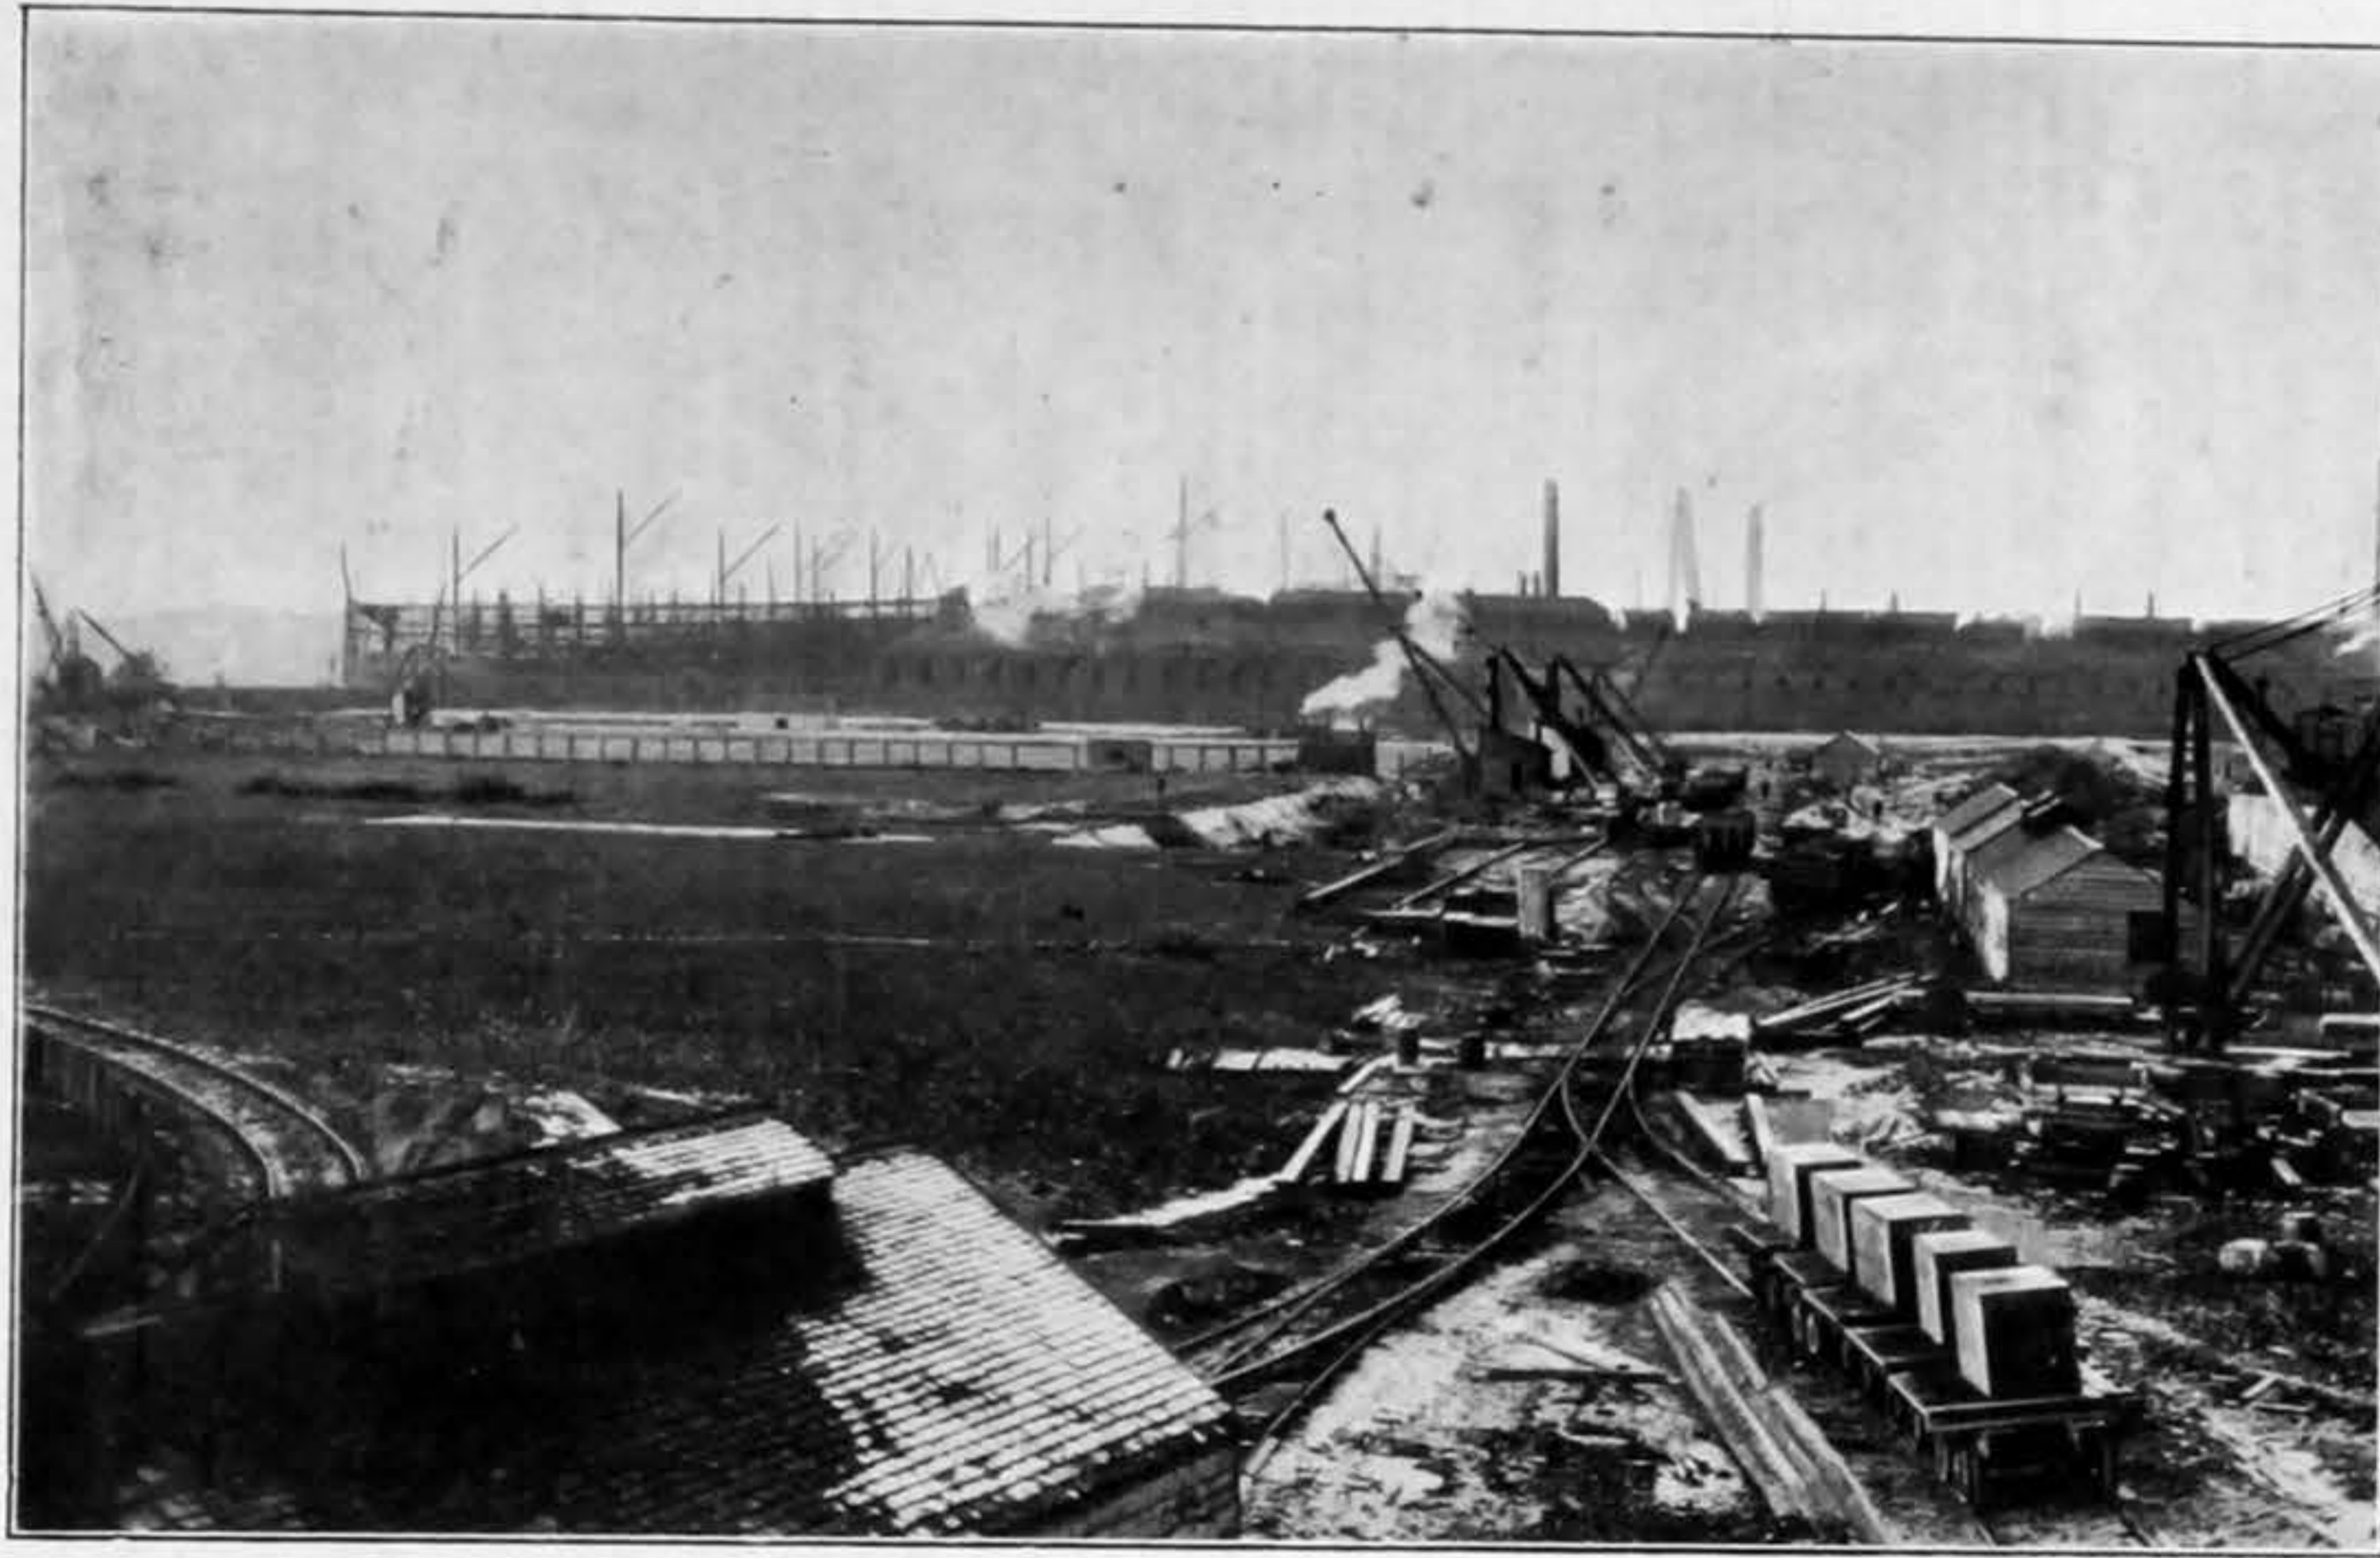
DOCK SITE, SHOWING WALLS UNDER CONSTRUCTION
